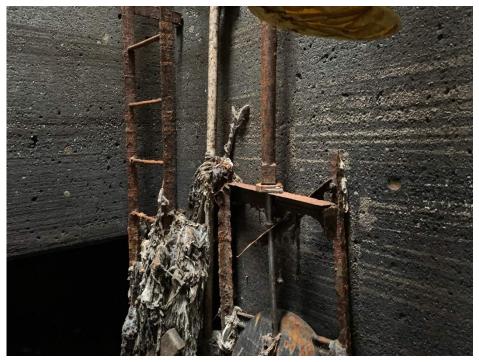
Concrete walls, lower wet well at dividing wall. Some erosion of concrete surface exposing aggregate.
